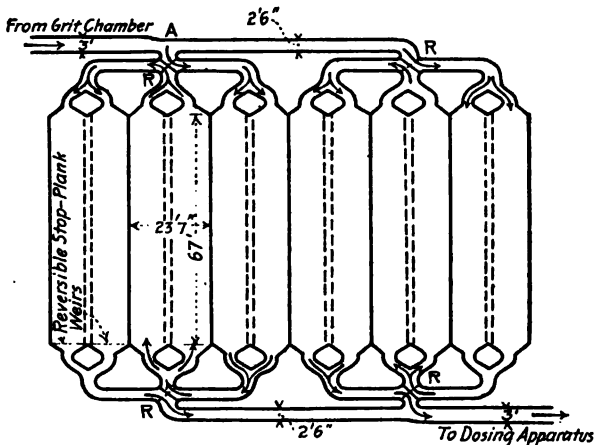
Inlet and outlet channels, Schenectady Imhoff tanks.
